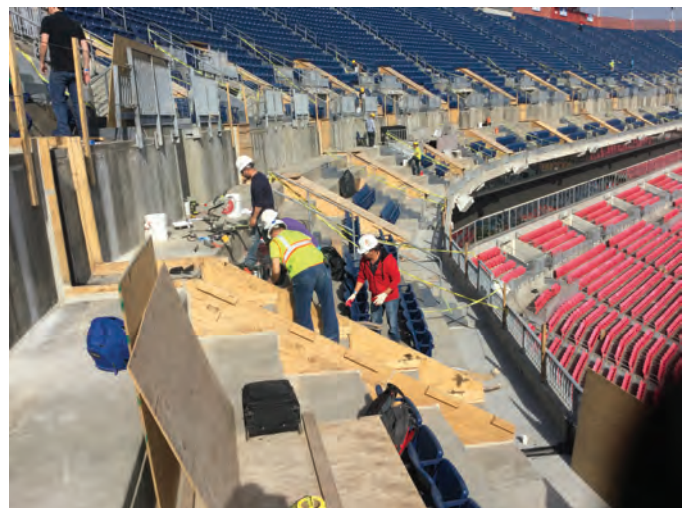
Upper deck repairs in progress (note Row A at overhang at upper deck and temporary joint protection)
